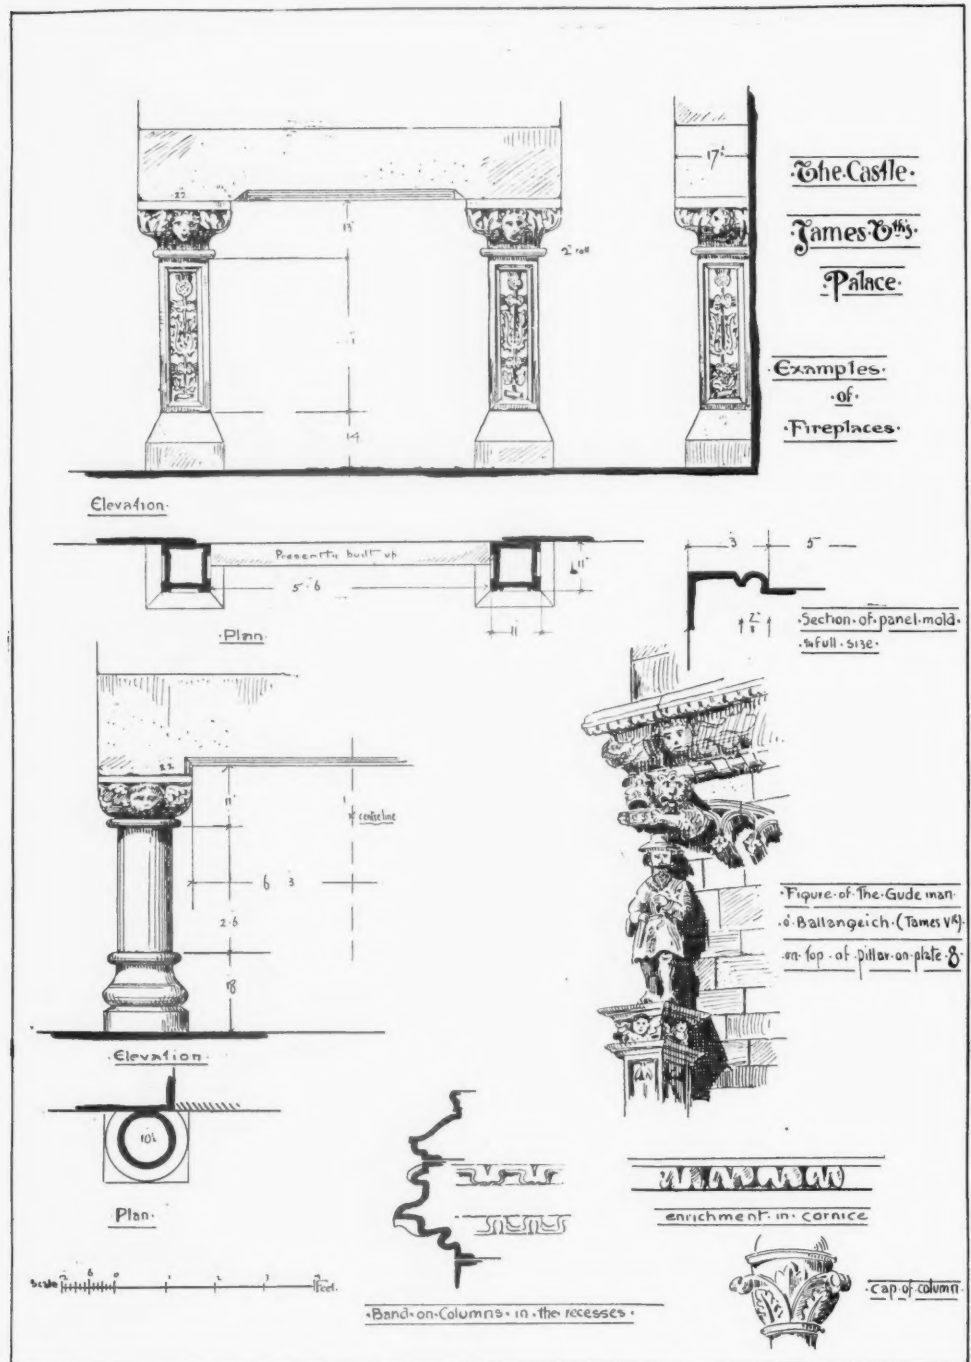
STIRLING CASTLE: STONEWORK DETAILS.
